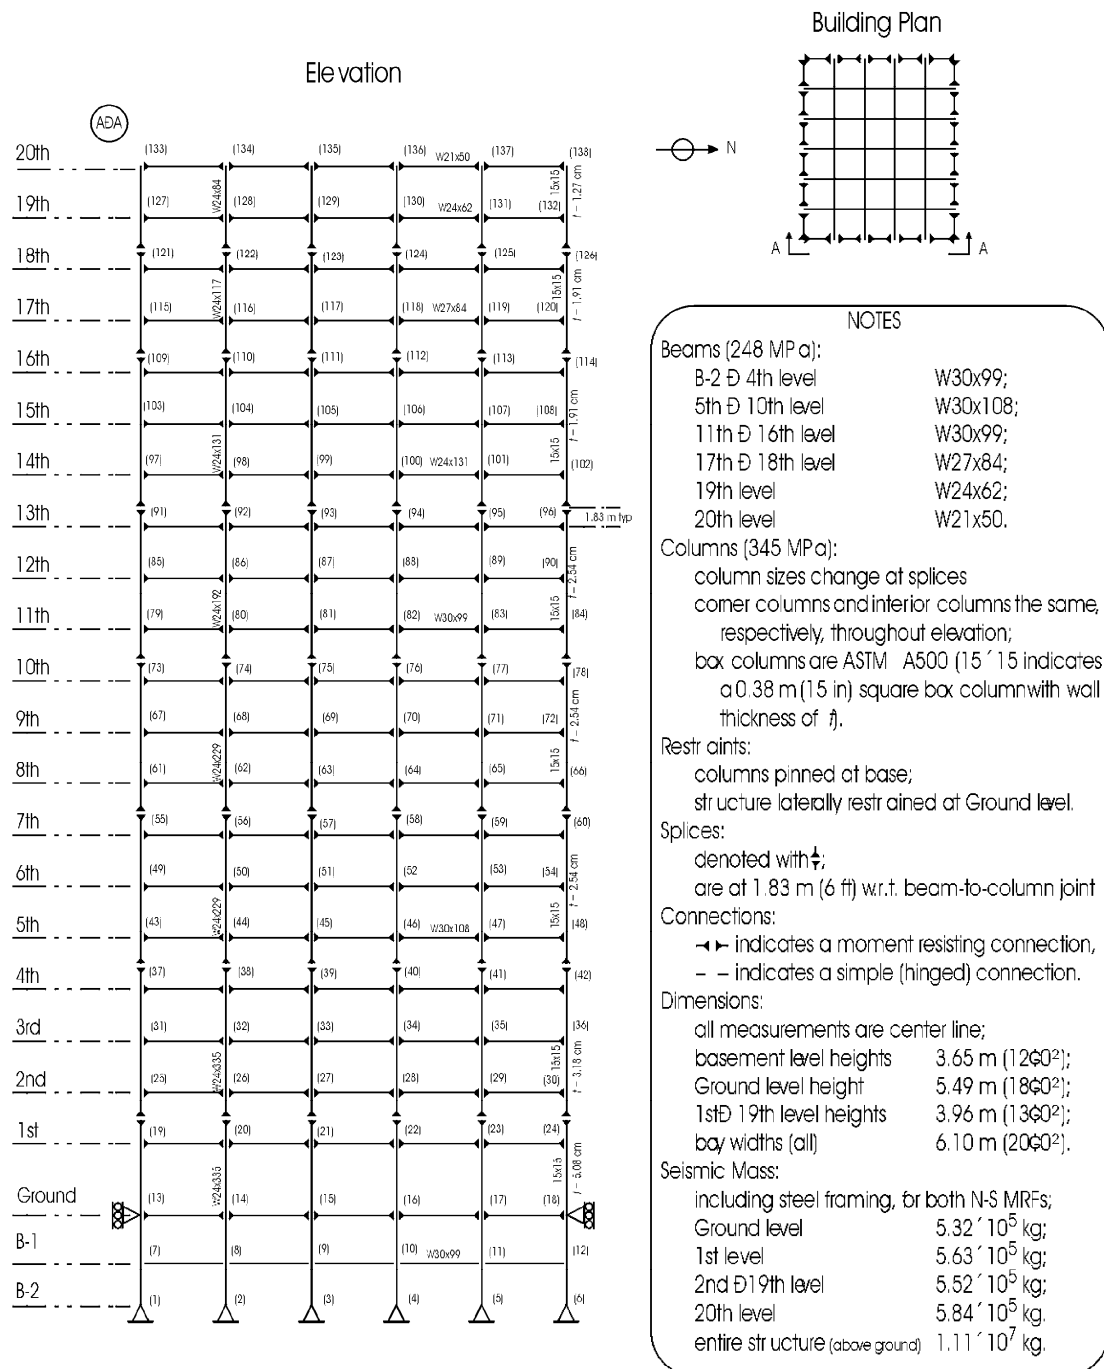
20 DOF benchmark structure N-S direction, Moment Resisting Frame (MSR), see Ohtori et al.³
